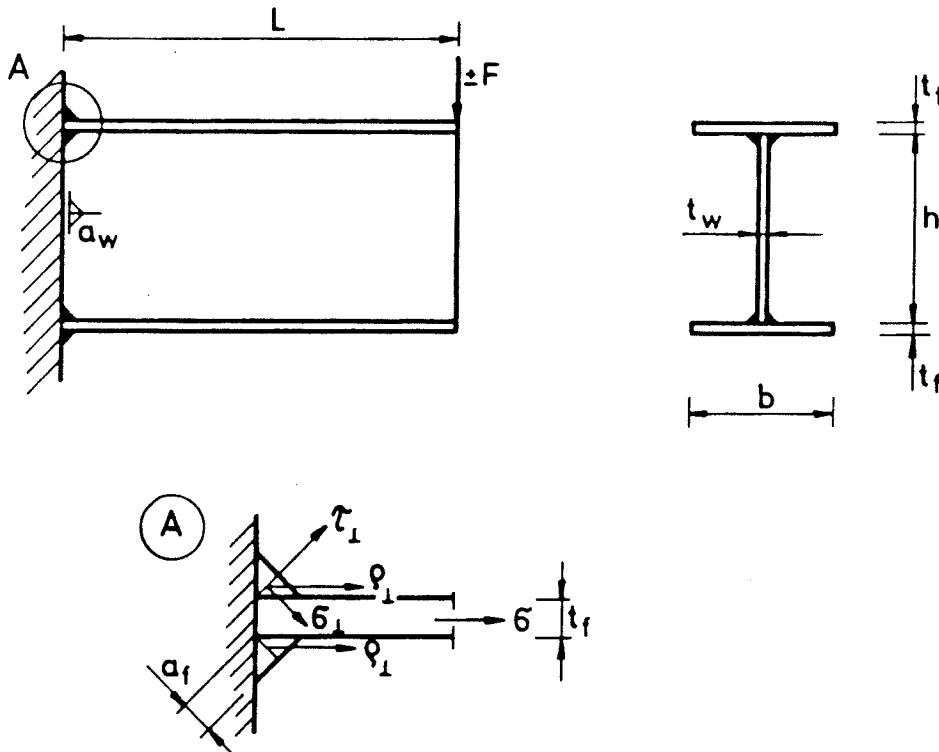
Welded I-section cantilever and the stress components in the connecting fillet welds
